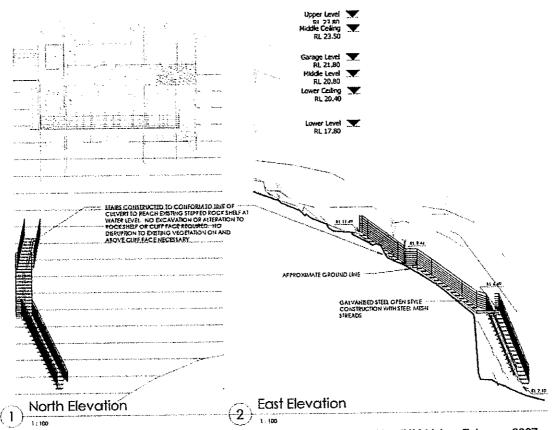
Drawing no. 45.06A showing the staircase in elevation, prepared by JHM Living, February 2007.
